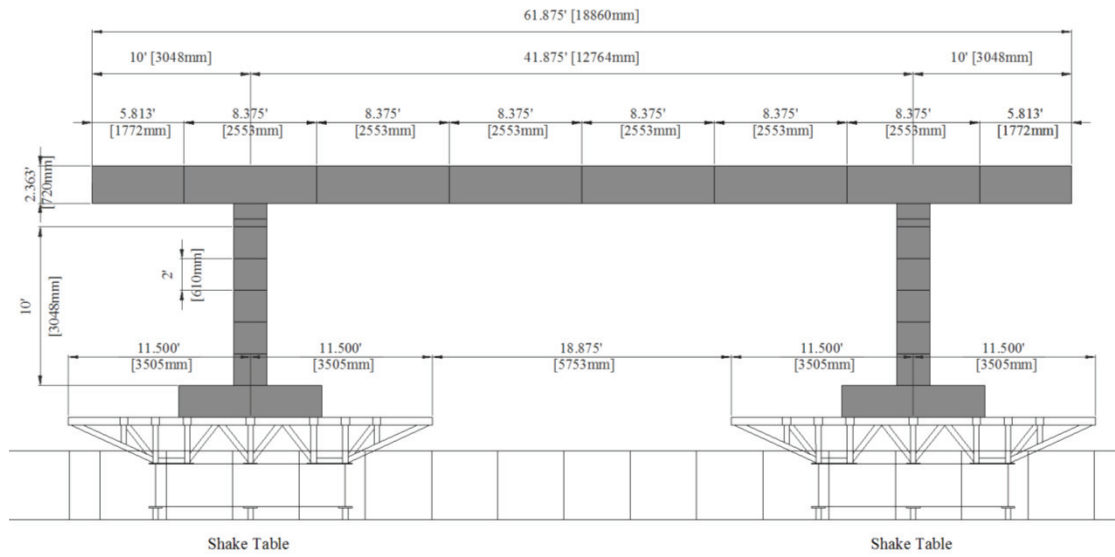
Elevation of 1/2.39-scale bridge test model on the dual shake tables of SEESL (UB)
